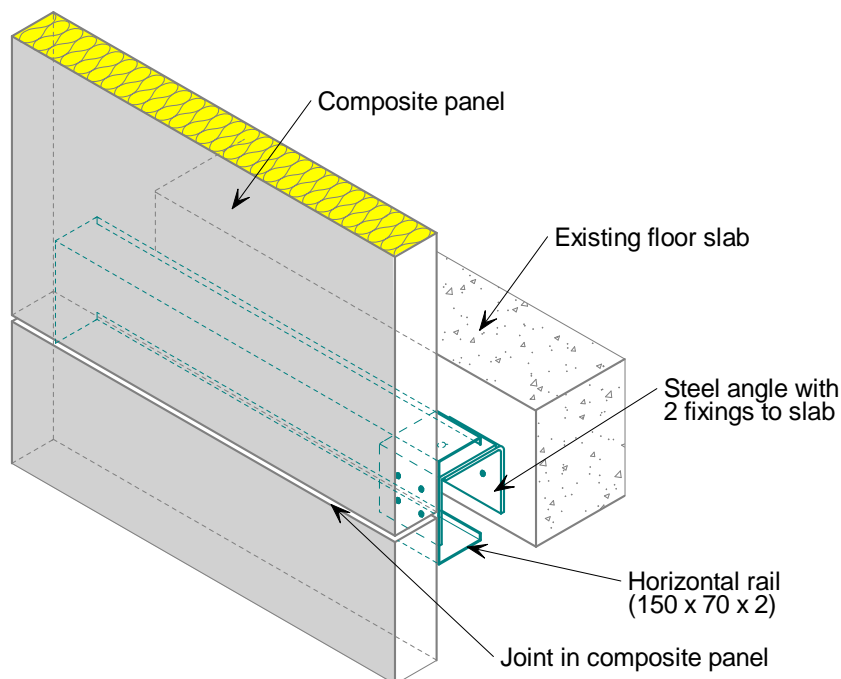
Horizontal rails and vertically spanning cladding, such as composite panels
